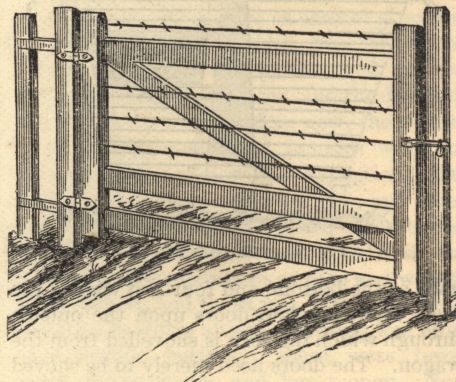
A CHEAP GATE OF BOARDS AND WIRE.
